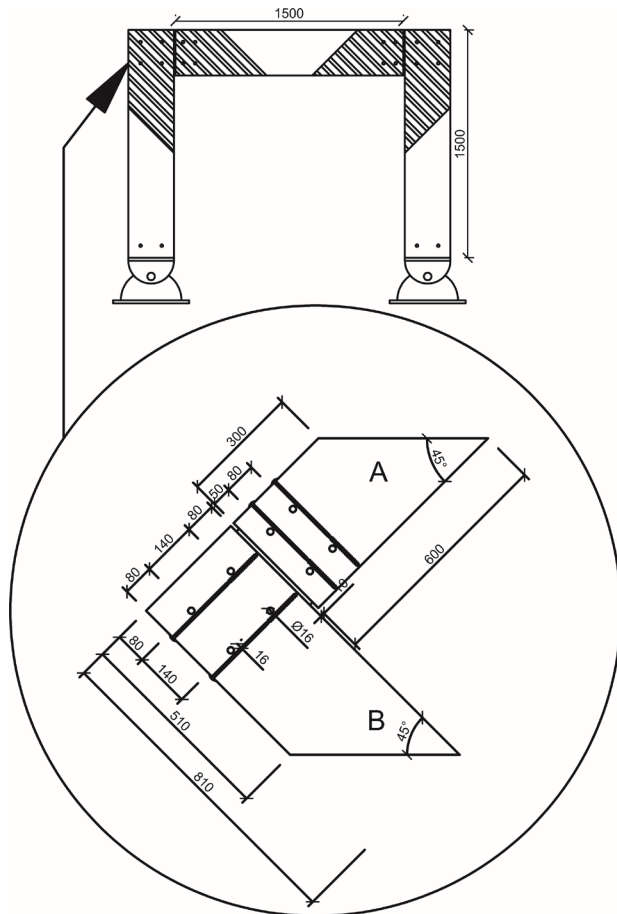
Drawings of the portal frame and the shaded parts are the beam-to-column connections tested in this study
